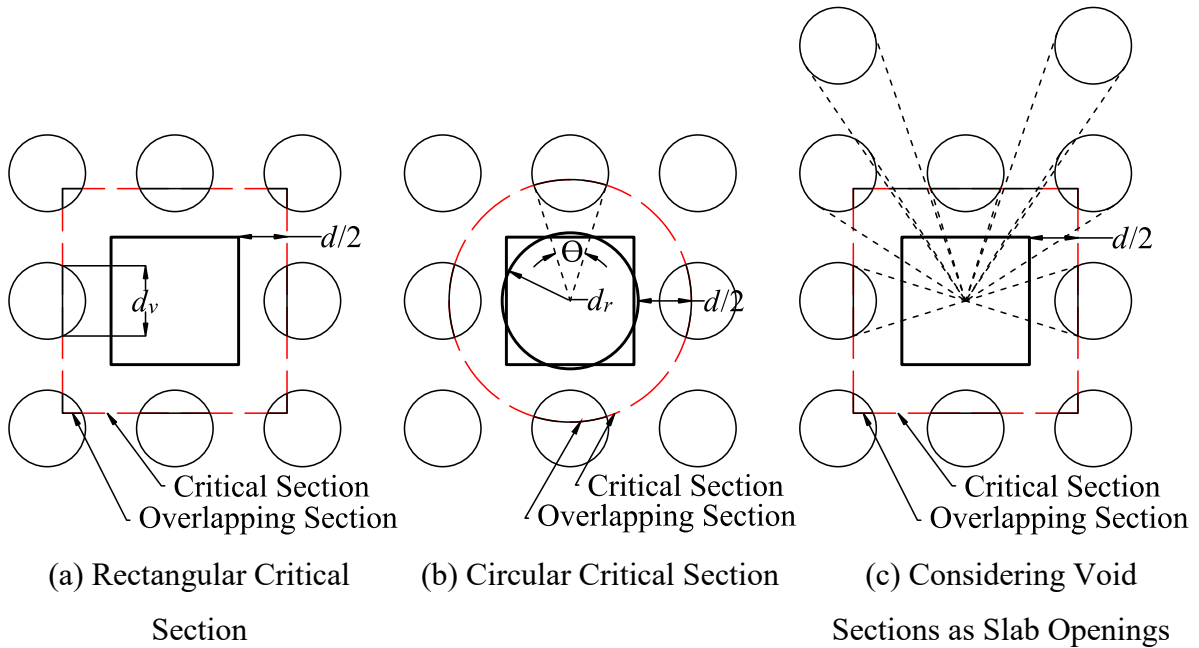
Assumed Critical Sections in Voided Slabs
